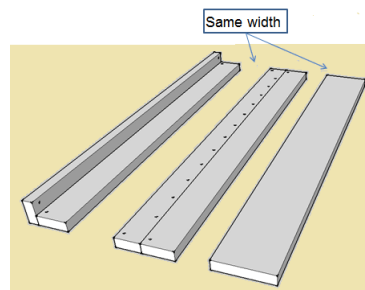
The sum of the horizontal and vertical section of the floorplates equal the width of a floorplate.
